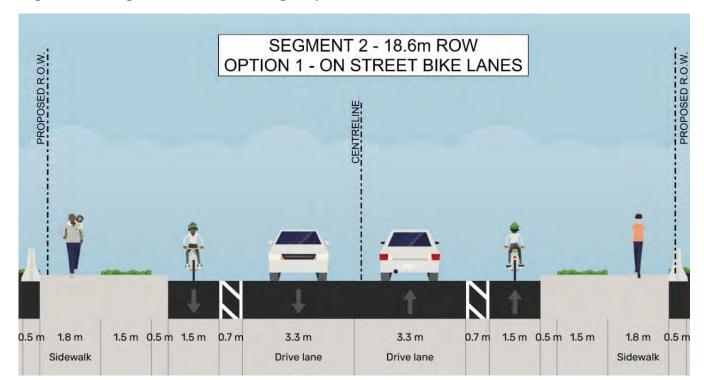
Segment 2 - Road Design Option 1 - Sidewalks and On-Street Bike Lanes
